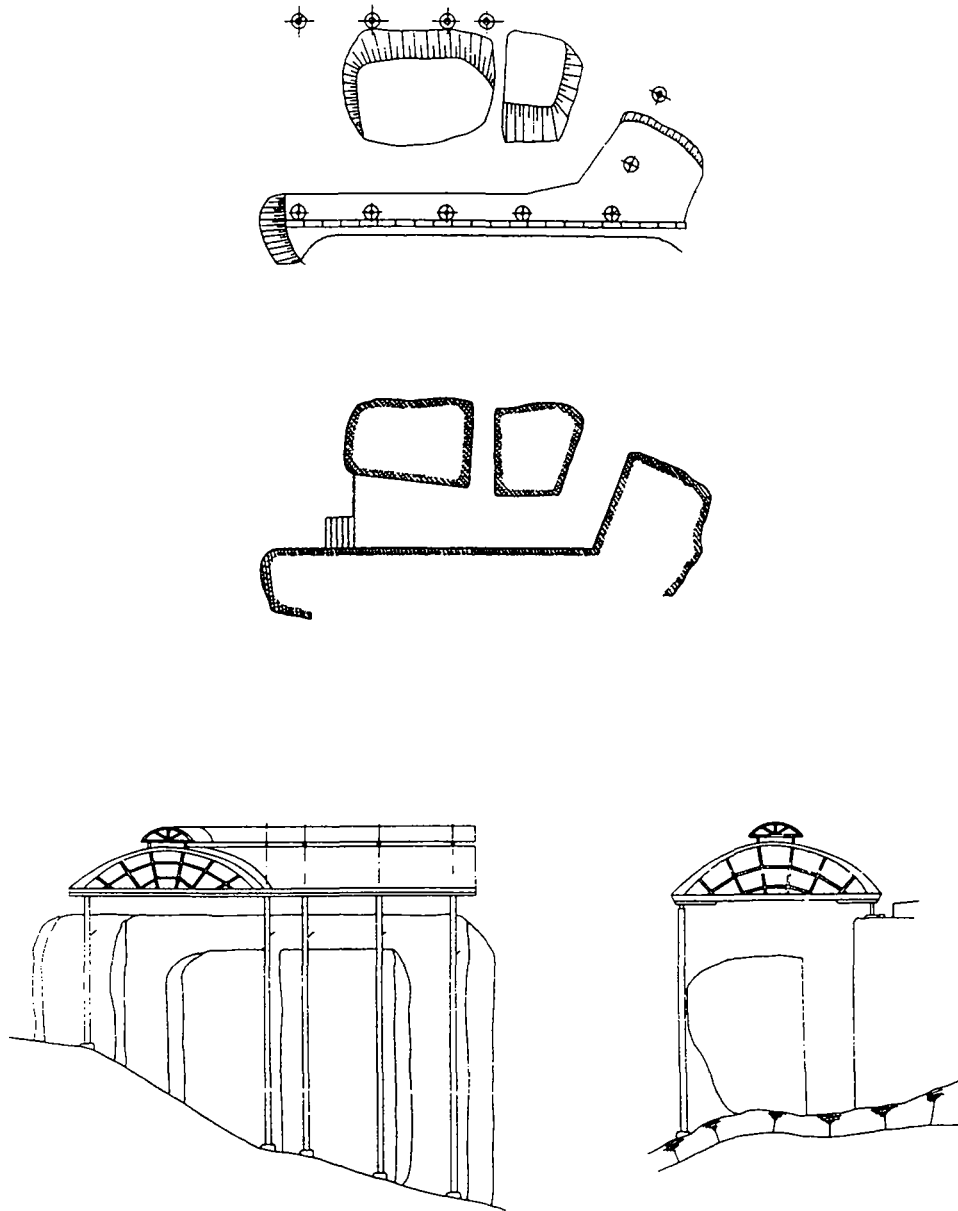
Two plans and two elevations of the modern protection structure of Sin-sŏn-sa
